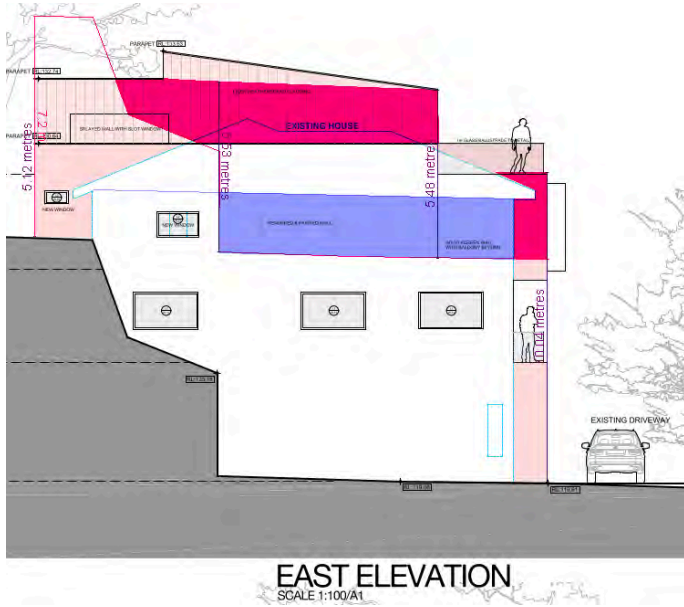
Proposed eastern elevation wall height breach. Extent of breach indicated in pink shading (existing approximate breach indicated by purple shading).
